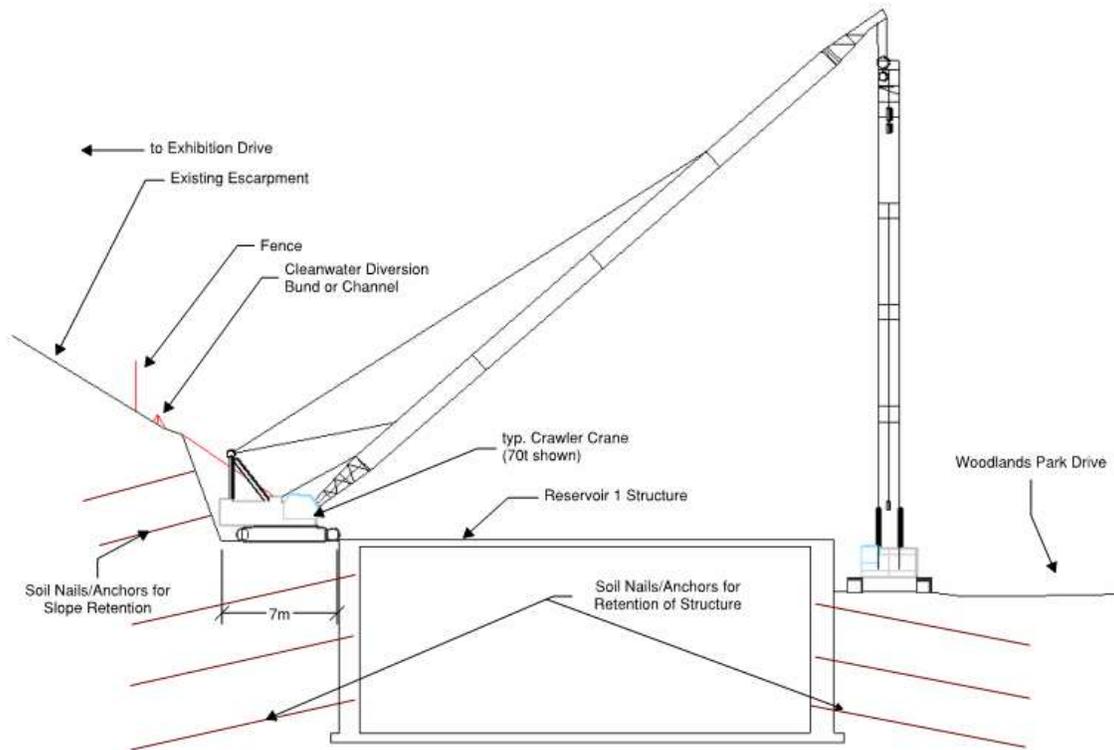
Reservoir 1 Crawler Crane and Access Track Northern Side Section
